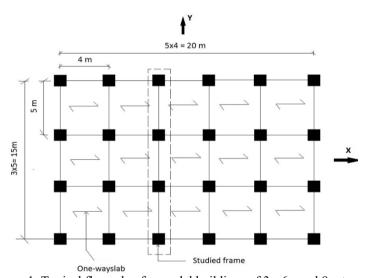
Typical floor plan for model buildings of 3-, 6-, and 9- story
